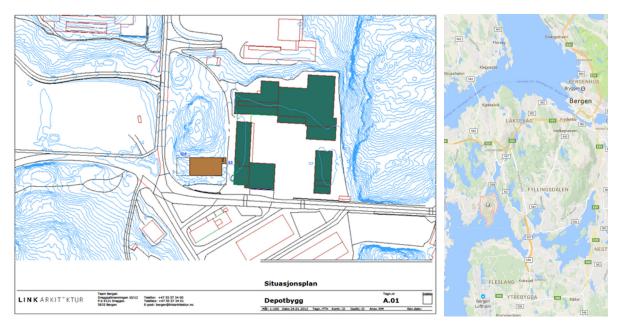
Site plan indicating the footprint of the Visund building in orange. Illustration: LINK Arkitektur (left), Google maps (right).
